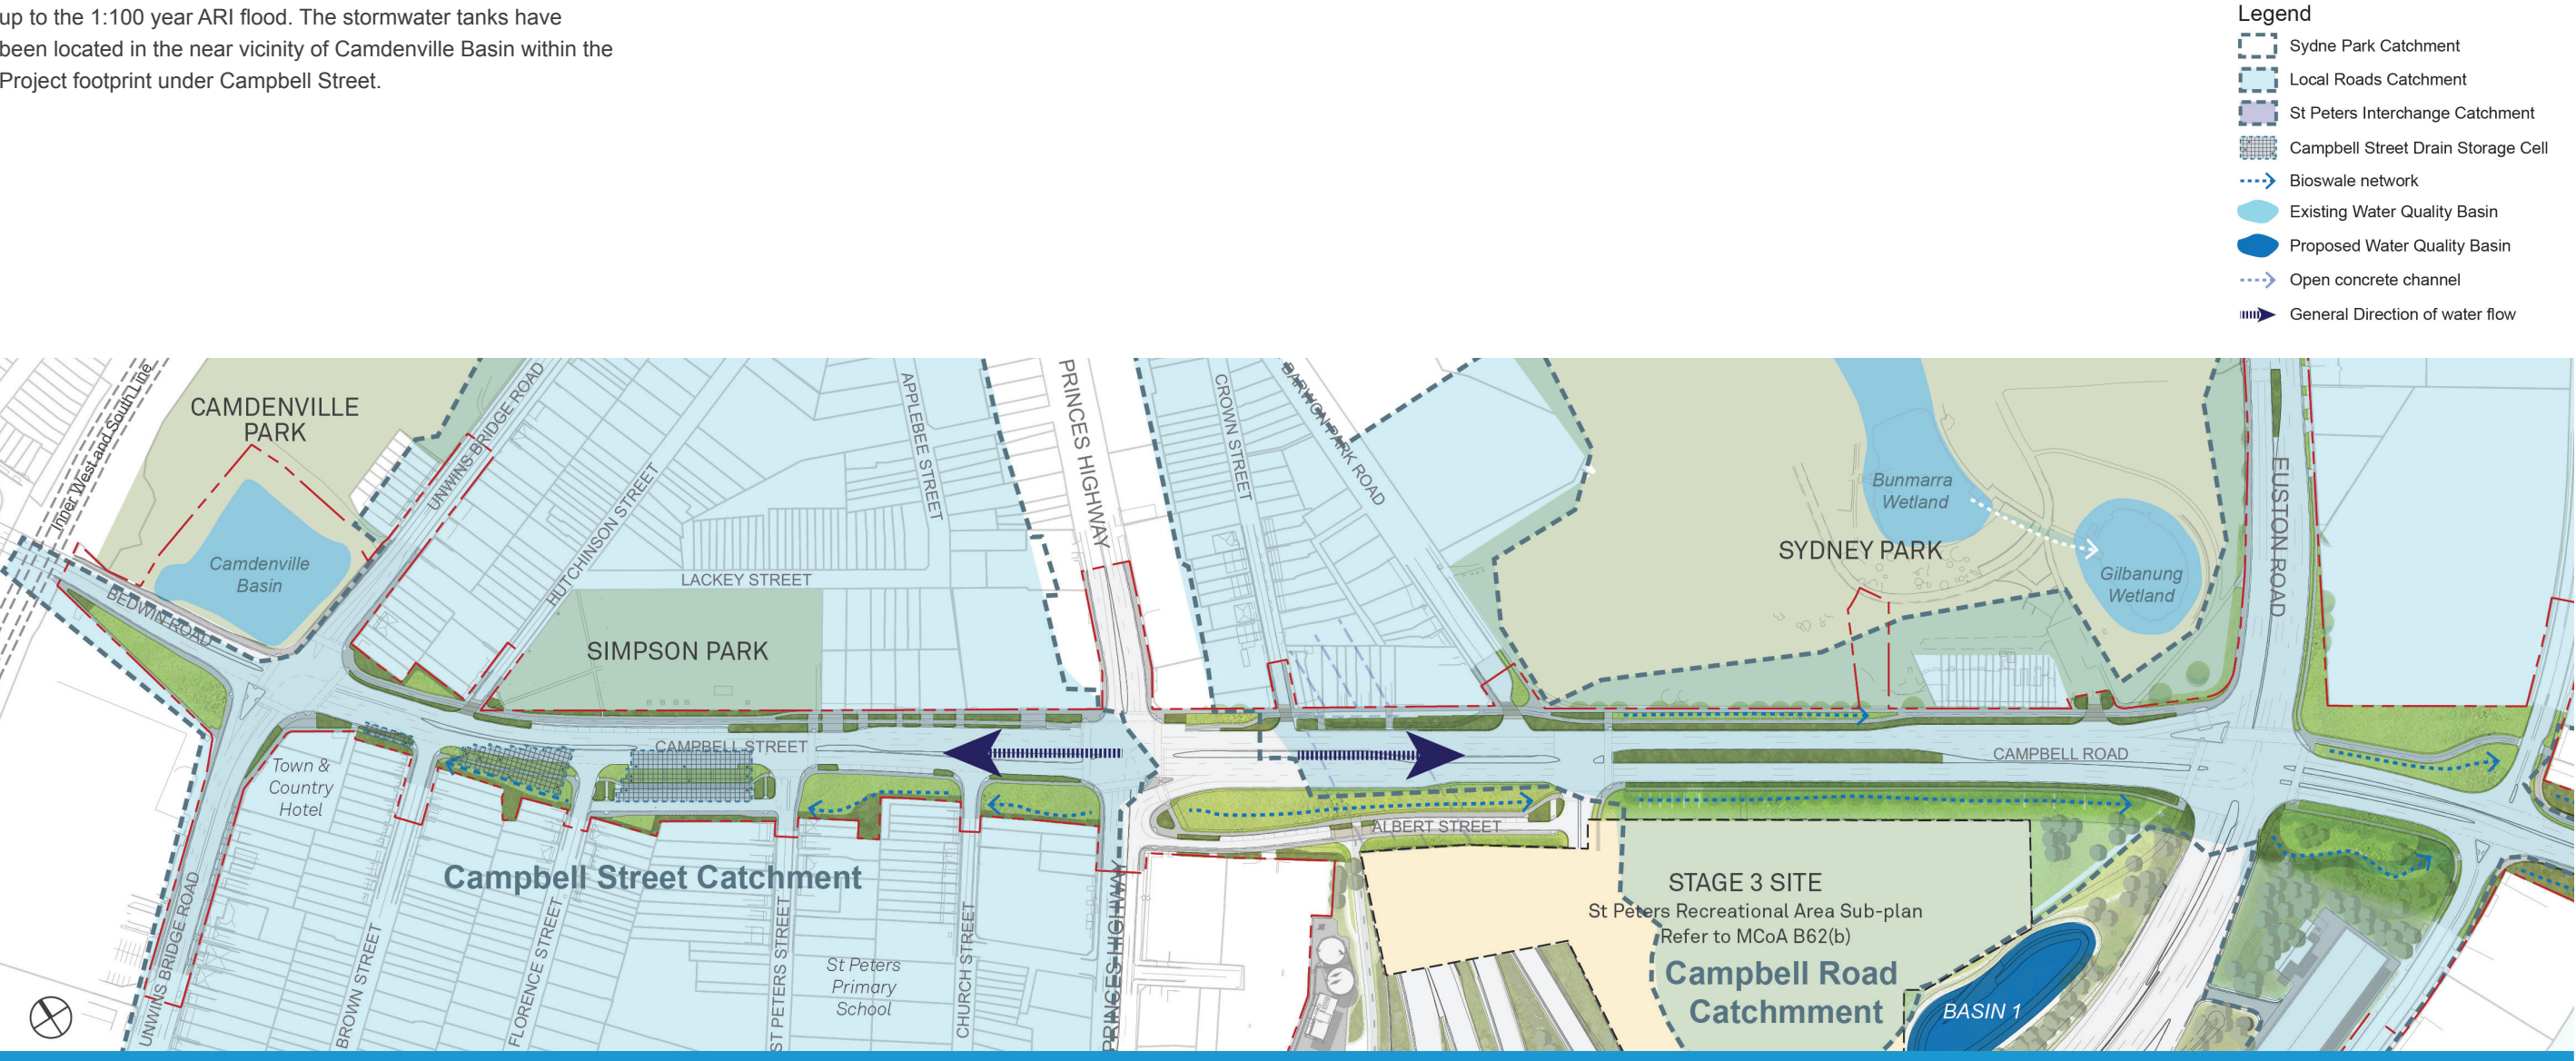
Campbell Street Green Link - Catchments - Plan
